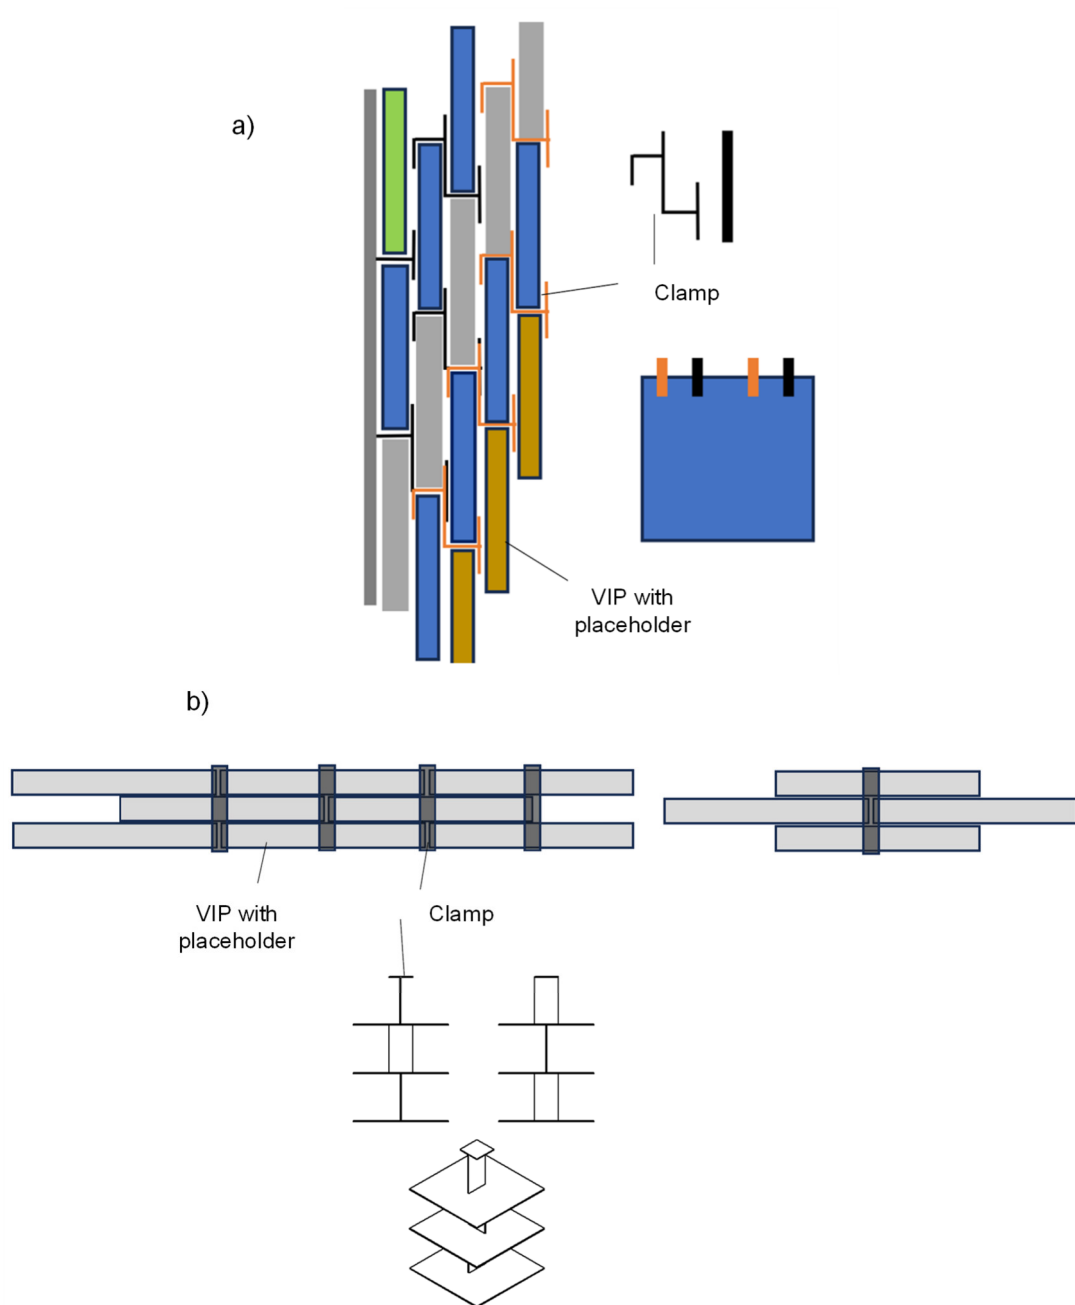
Suspension method with clamps for VIPs positioned in a) vertical walls and b) roofs
